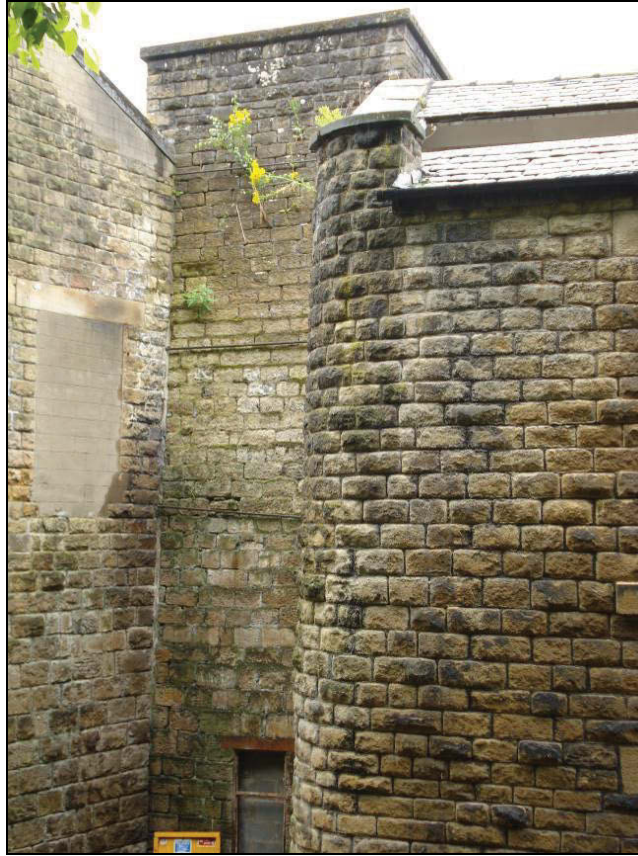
Former chimney stack adjoining the southern elevation of Building D
